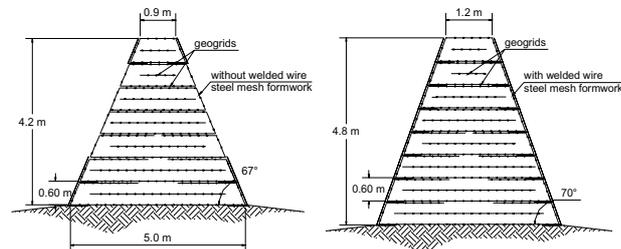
Sketched cross section of the embankments built for test 4 and 5.
